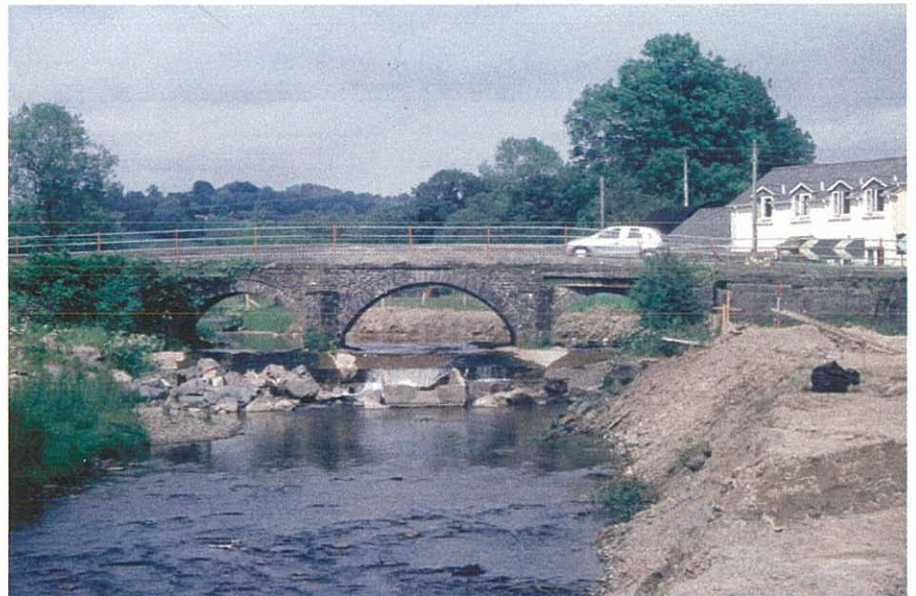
Early stages of construction showing topsoil strip alongside A482 to the north of the 1822 bridge.
